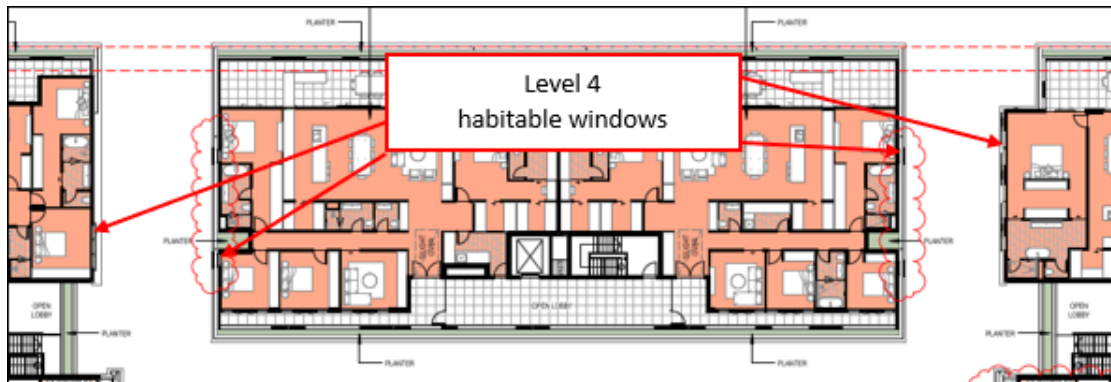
Interfacing windows of Building B to Buildings A and C for Level 4
